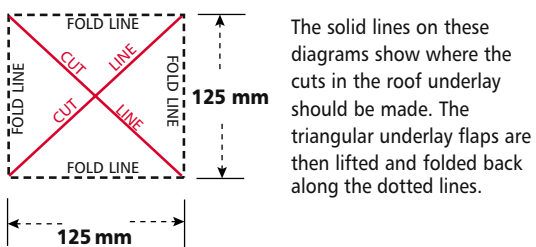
Roof underlay cutting/folding for soil pipe adapter
